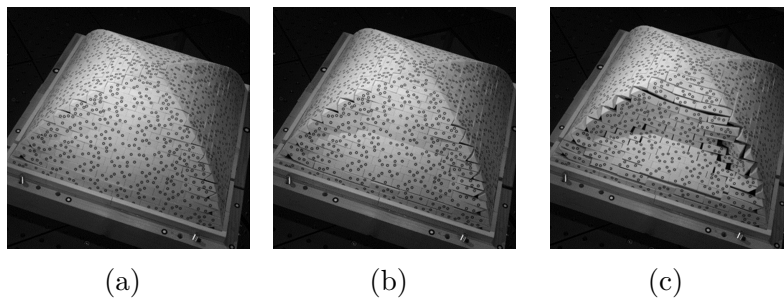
Collapse mechanism of a masonry pavilion vault on spreading supports. Credit: [Rossi et al. \(2017\)](#).
